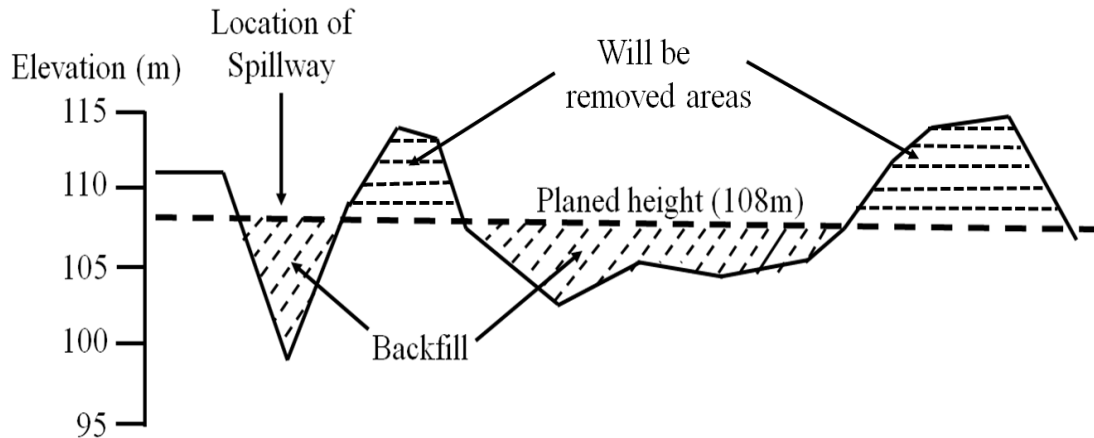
Section plan of Renyitan Reservoir spillway and adjacent area
